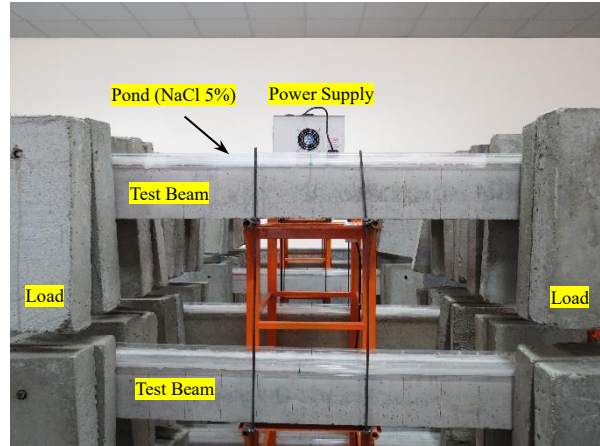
Test frame for beams under 8% loading and accelerated corrosion.
